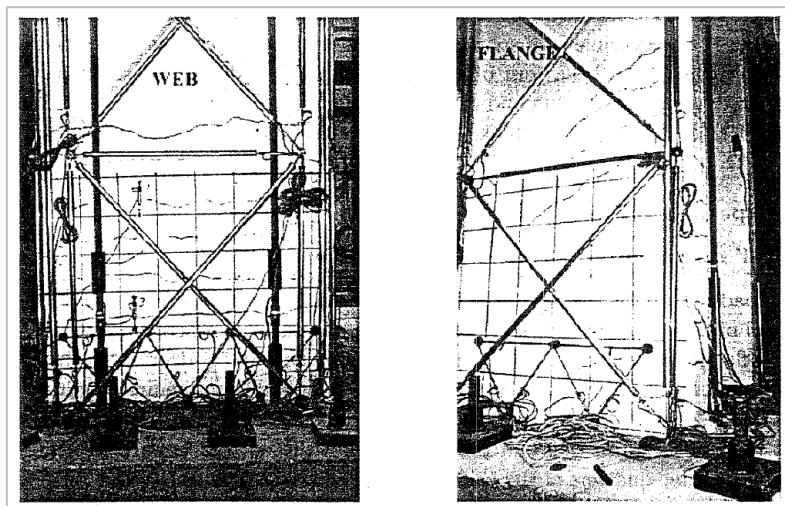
Crack pattern of wall during Y-direction testing for specimen tested by Ile and Reynouard (2005)
